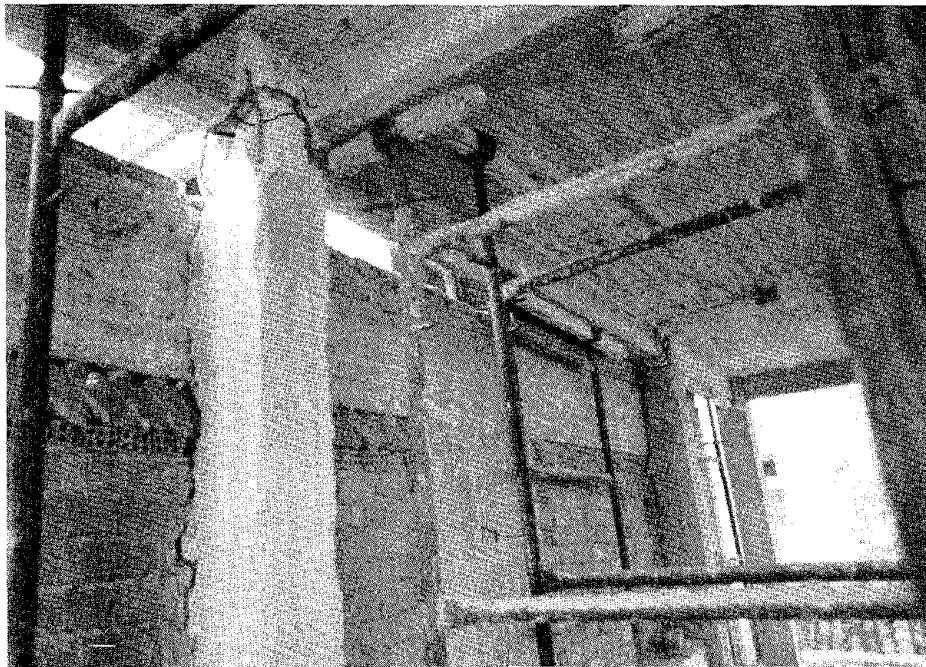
Hammer effect between two adjacent buildings not separated in Megara.
